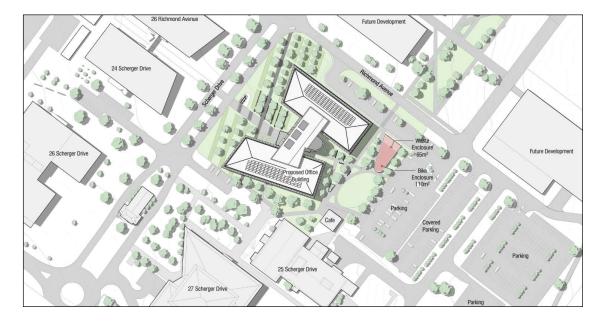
Proposal Site Plan (Source: Site Plan by AMC Architecture)
